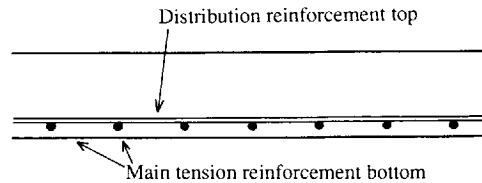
Cross-section through a one-way spanning slab showing the position of the reinforcement
